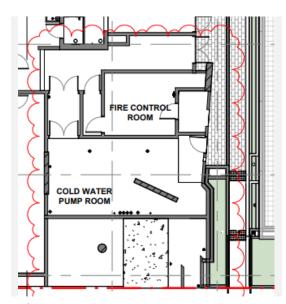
Stage 1 Mod 5 – Lower Ground Floor Plan extract, Rev E
